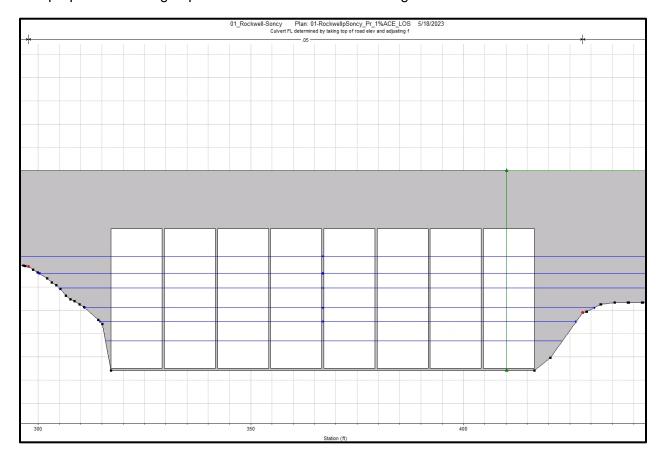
Proposed 1% LOS upstream cross section at West Rockwell Road crossing of Spring Draw.
